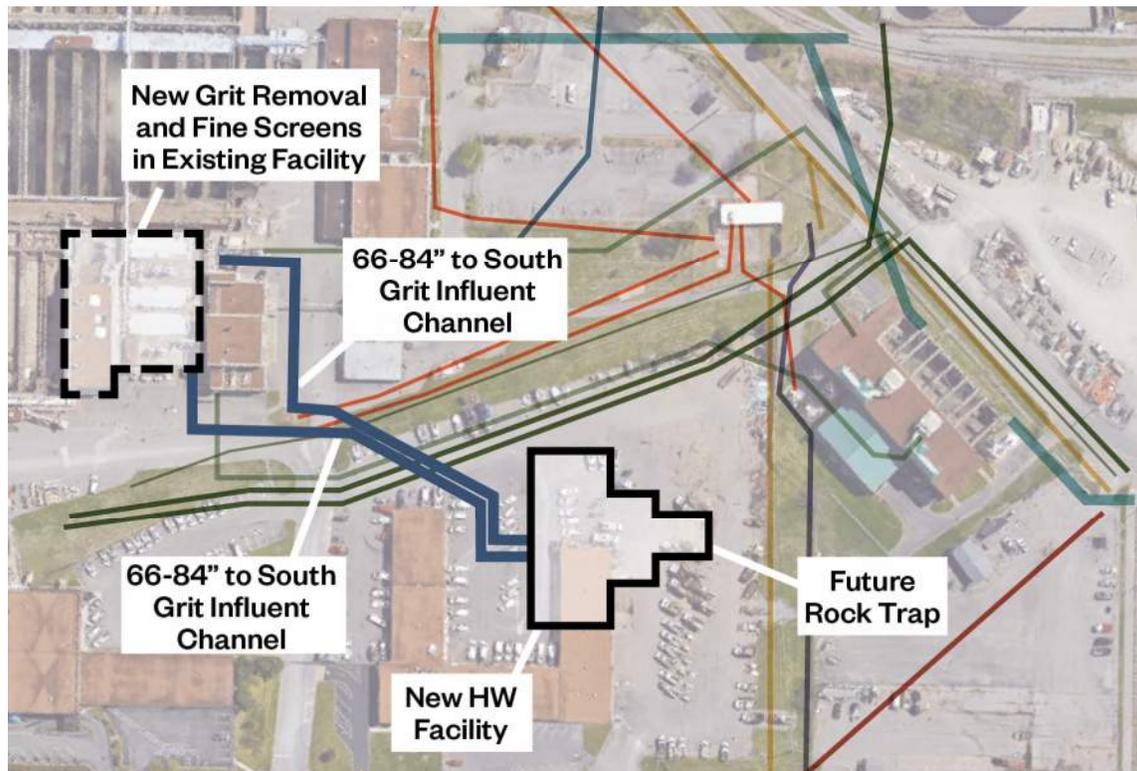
Alternative No. 2 Conceptual Site Layout
